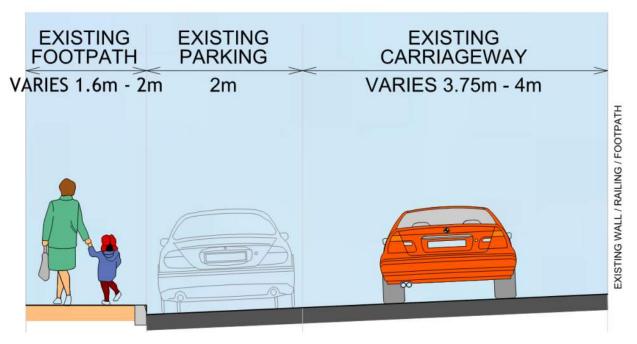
Typical Section 3 Do Nothing Scenario Cross Section SCR between Fennessy's Roundabout and Laurel Hill Avenue
